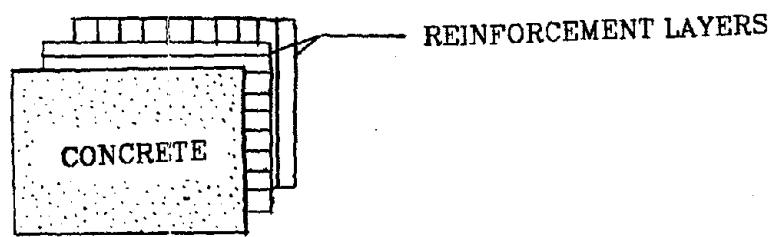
Distributed crack model for reinforced concrete model.
